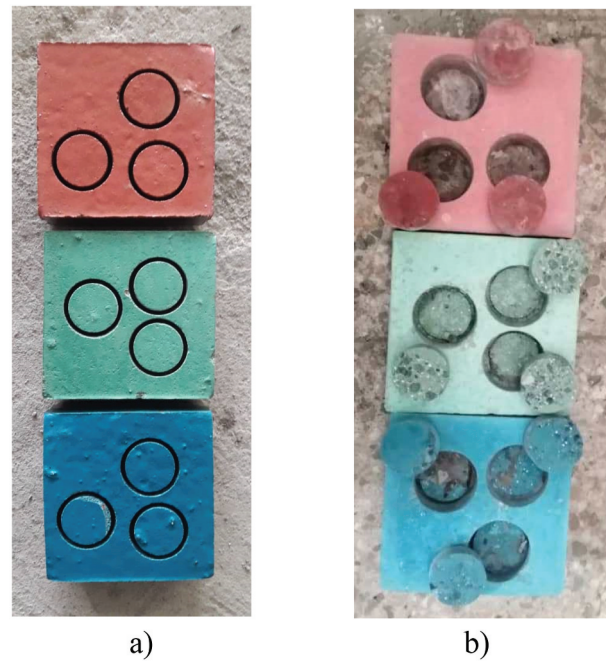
(a) View of pull-off specimens before applying the tensile force, and (b) Failure of coloured SCC repair layers from their concrete substrate.
